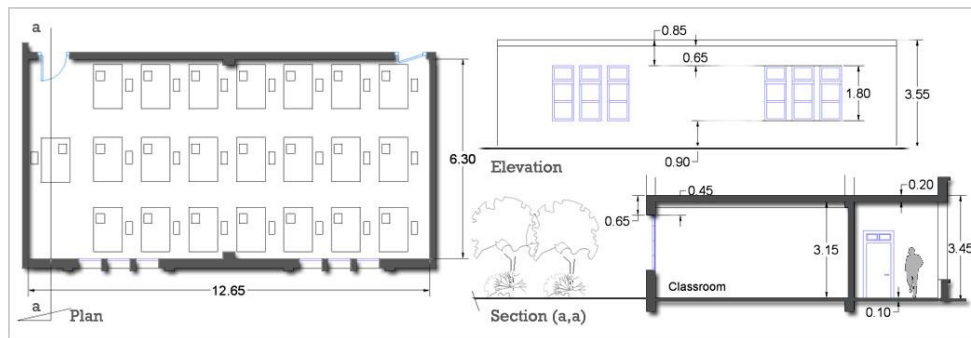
Plan elevation and cross-section of a typical classroom (A101)showing the location, dimension, types and form of fenestration openings.
